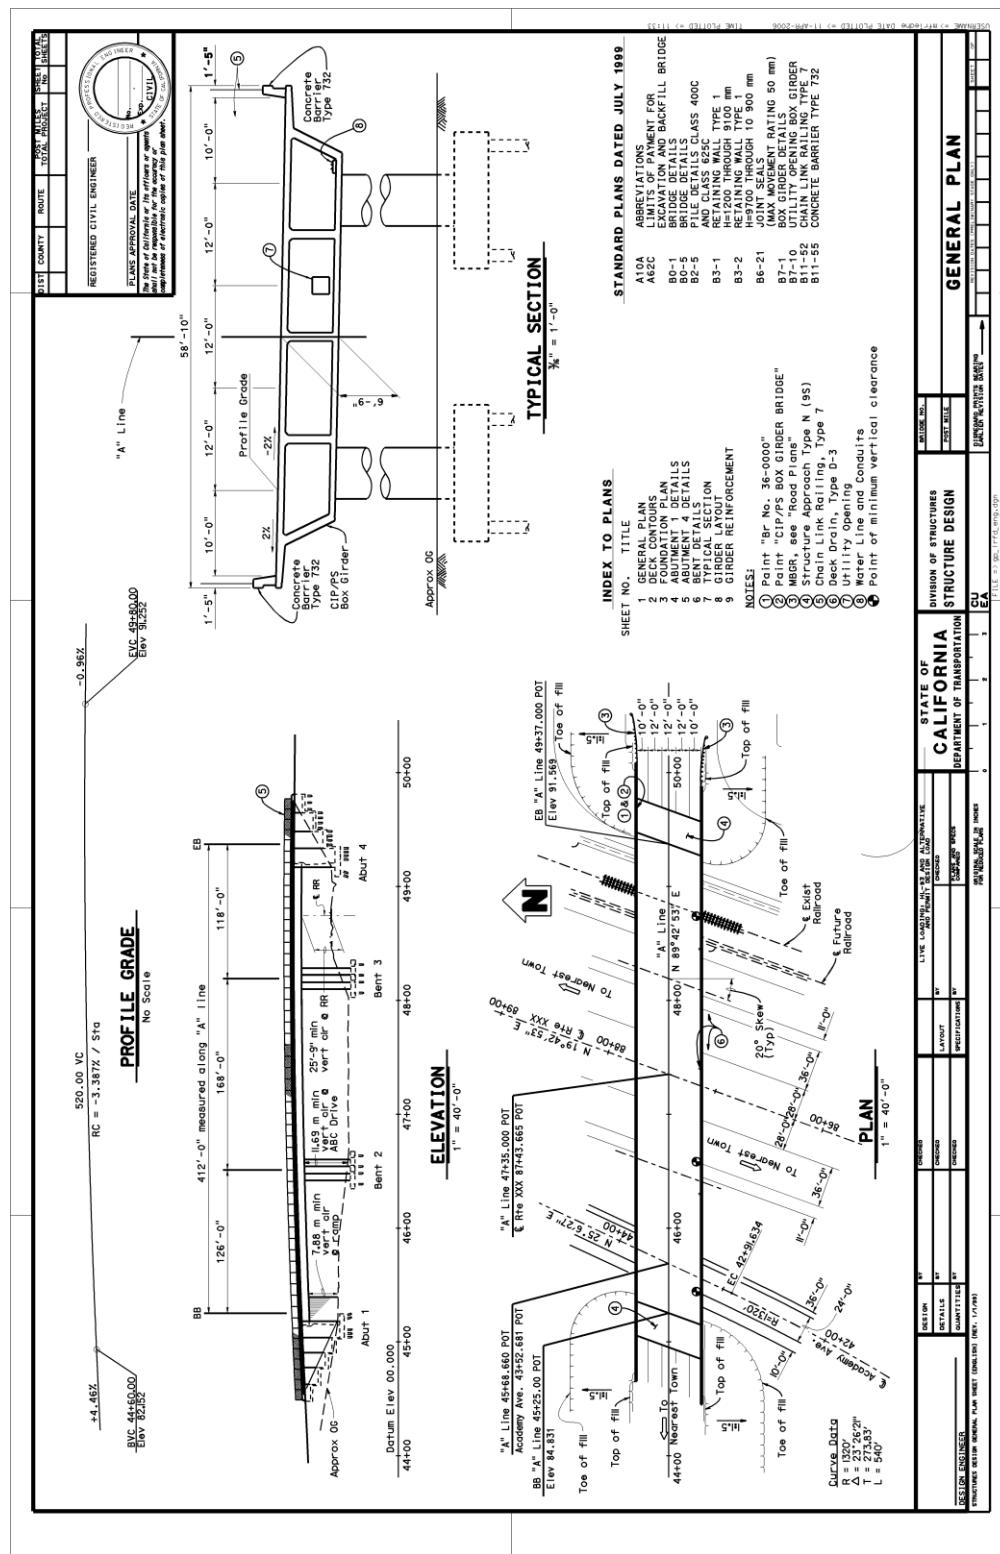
General Plan (Bridge Design Academy Prototype Bridge)
